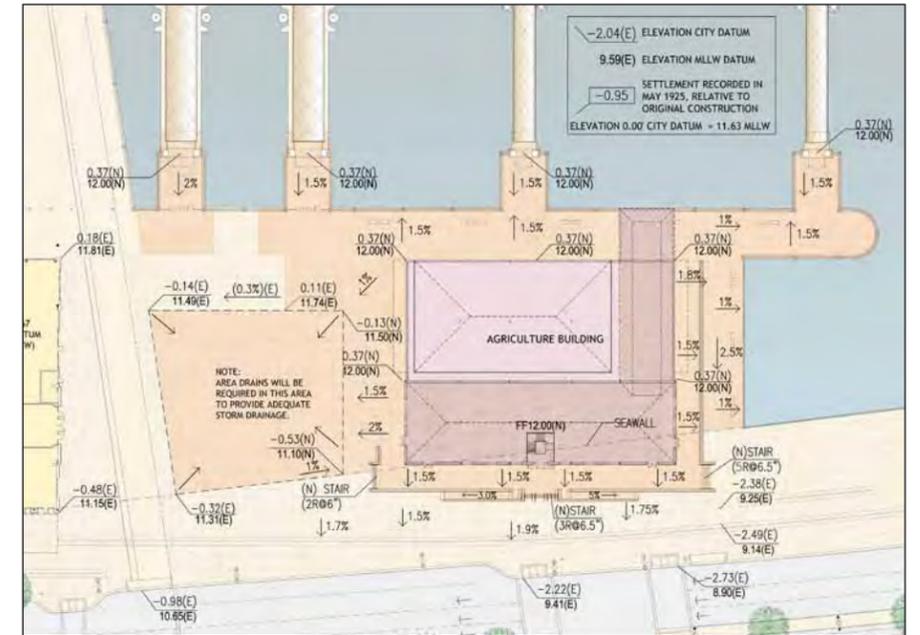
Preliminary Grading Concept Plan (tone indicates new fill)
